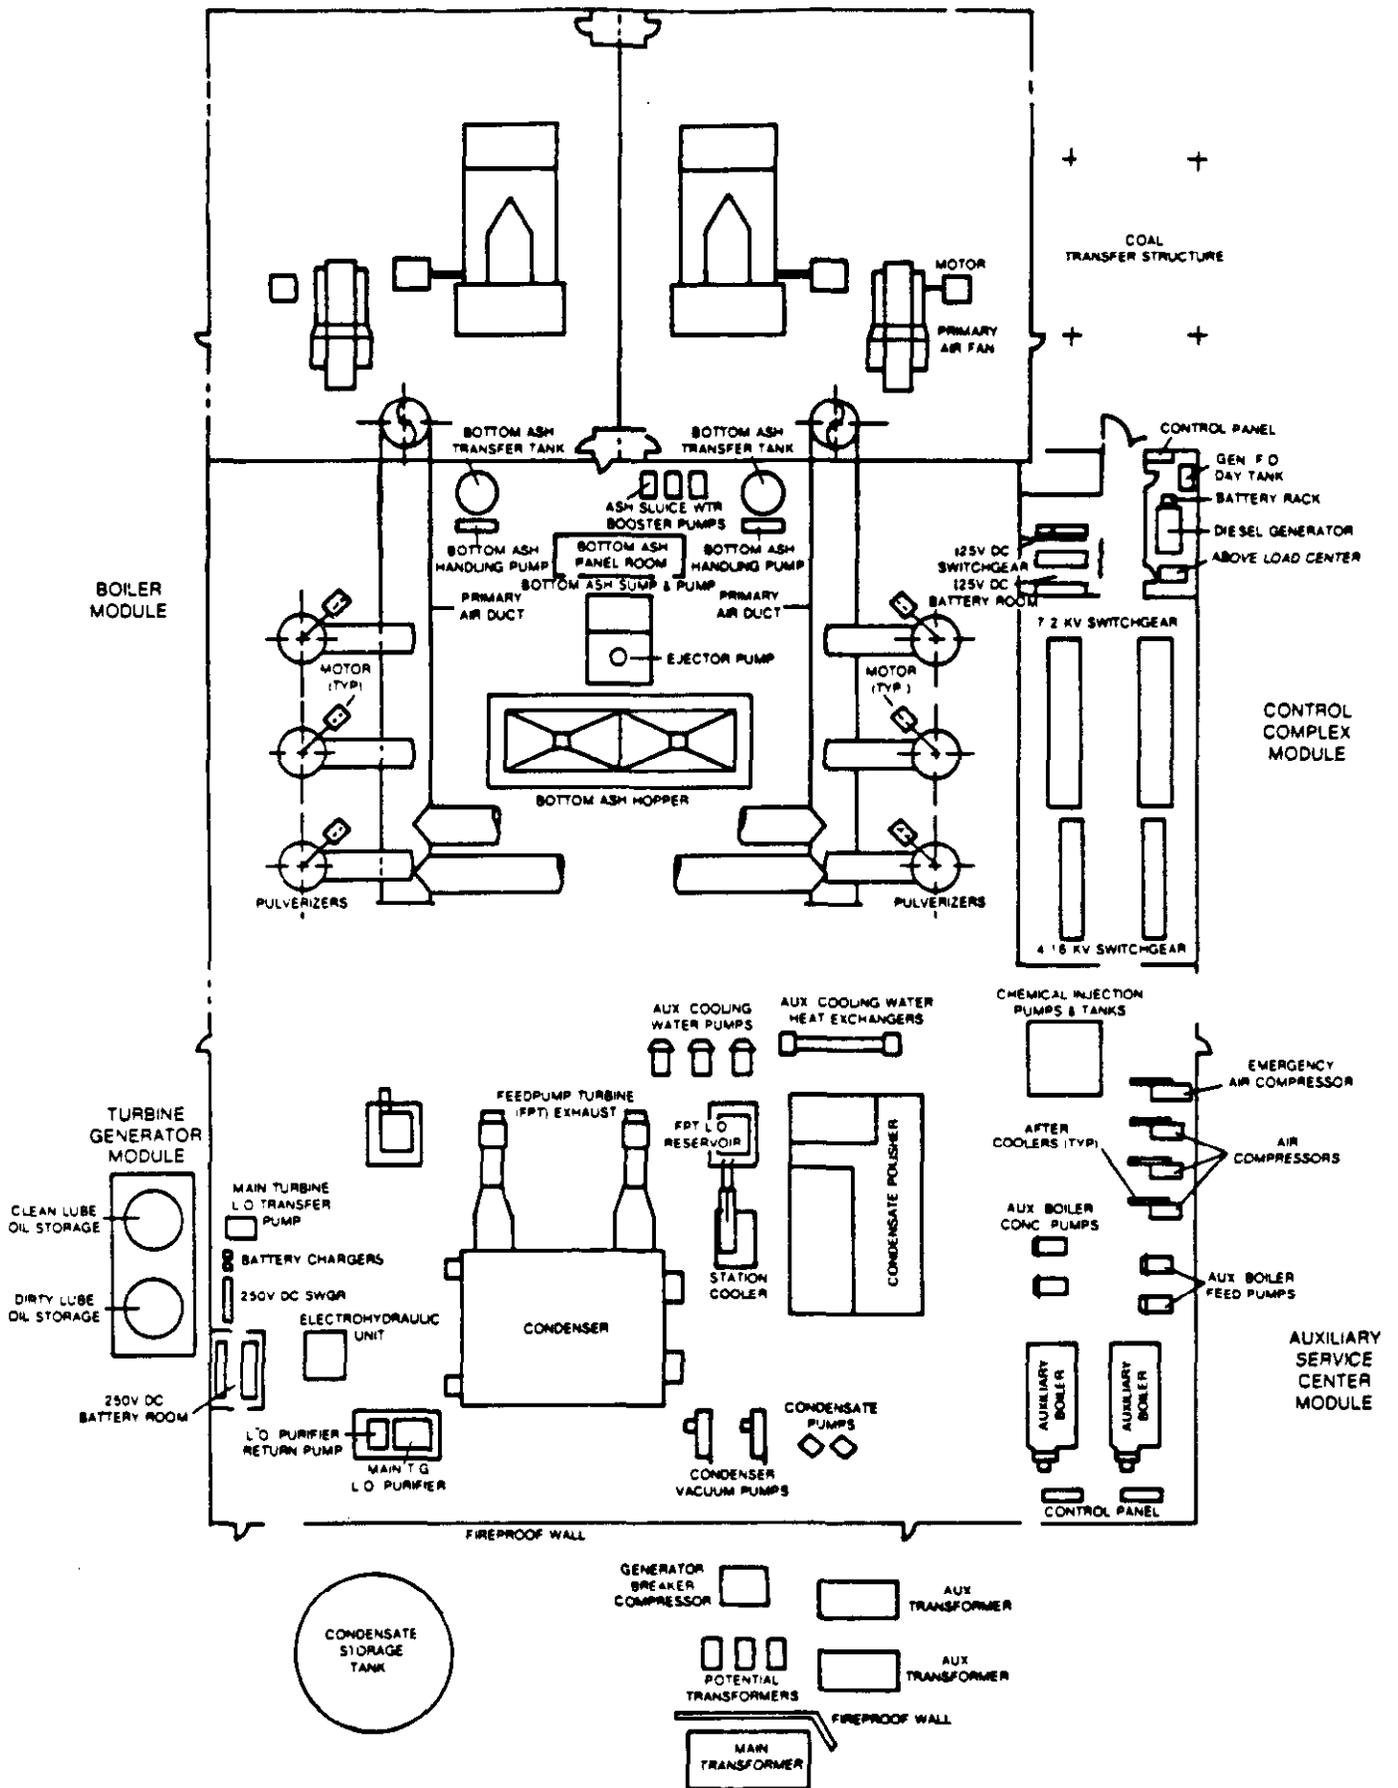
500 MWe Reference Plant Arrangement Plan Ground Floor
